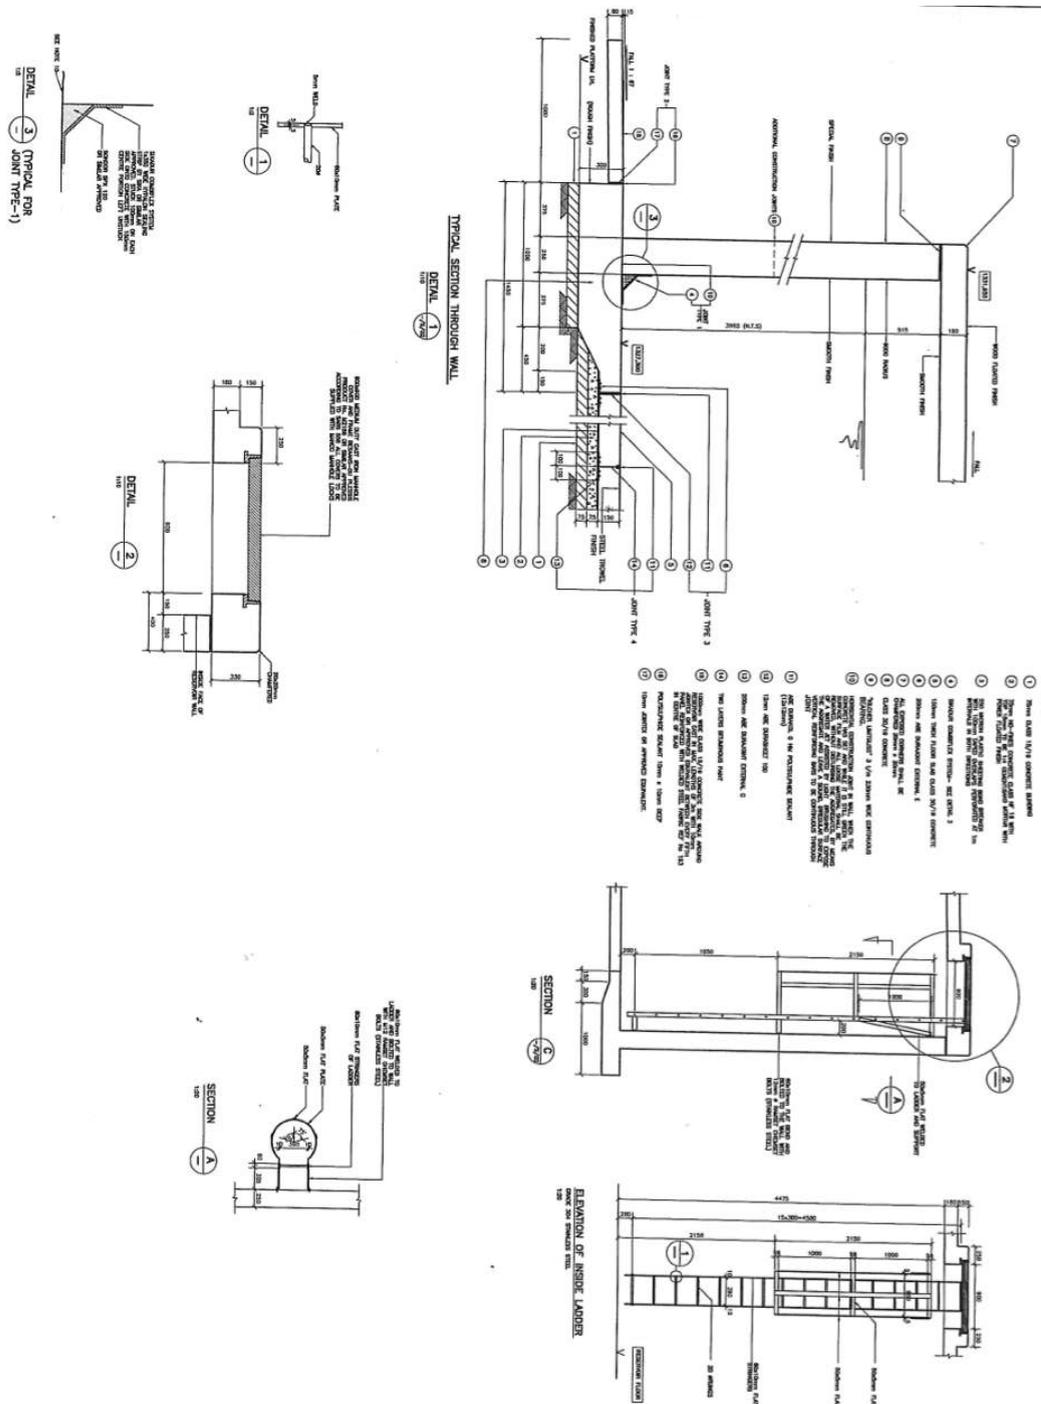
Beau Rivage 1 ML Reservoir - Wall Joints and Ladder Details [van Dalsen, 2014]
